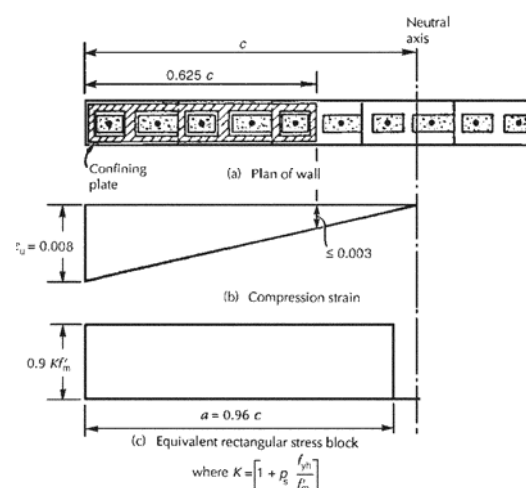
Rectangular stress block used for the design of concrete masonry having horizontal confinement plates in the mortar joints (SANZ 1990).
